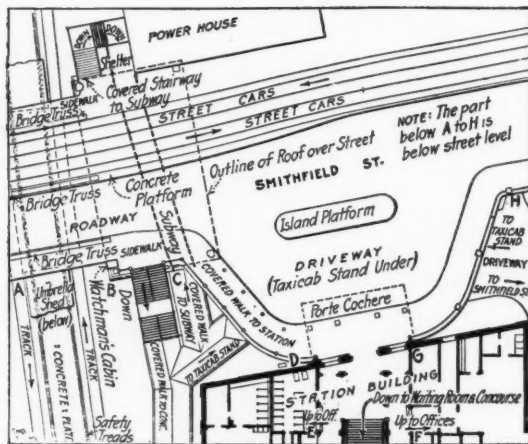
PLAN OF STREET SHELTER, COVERED WAY AND SUBWAY
